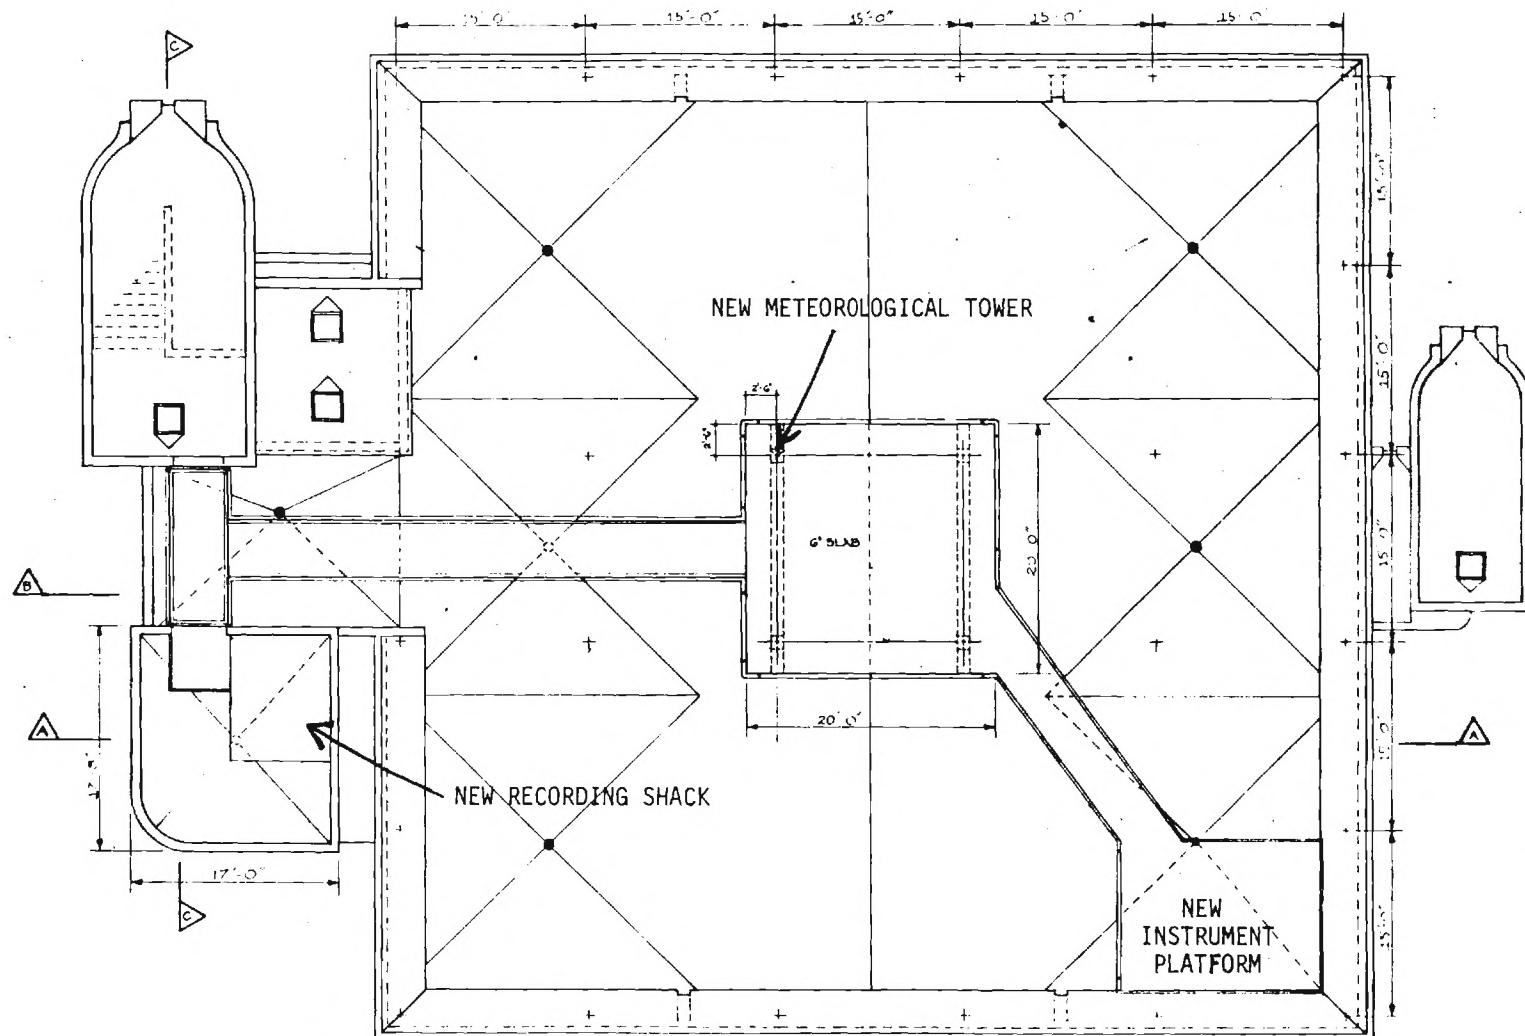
Plan View of Civil Engineering Showing Layout of New Facilities on Roof
